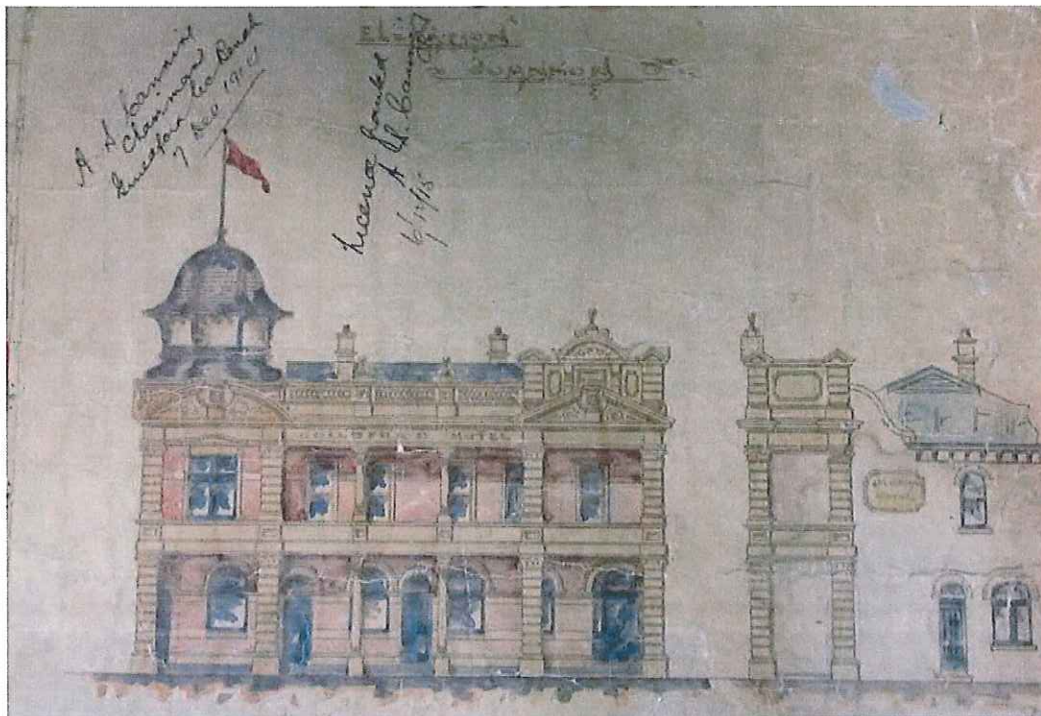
Elevations showing new façade to the Guildford Hotel – James Street elevation c.1914 Source- State Library of Western Australia
